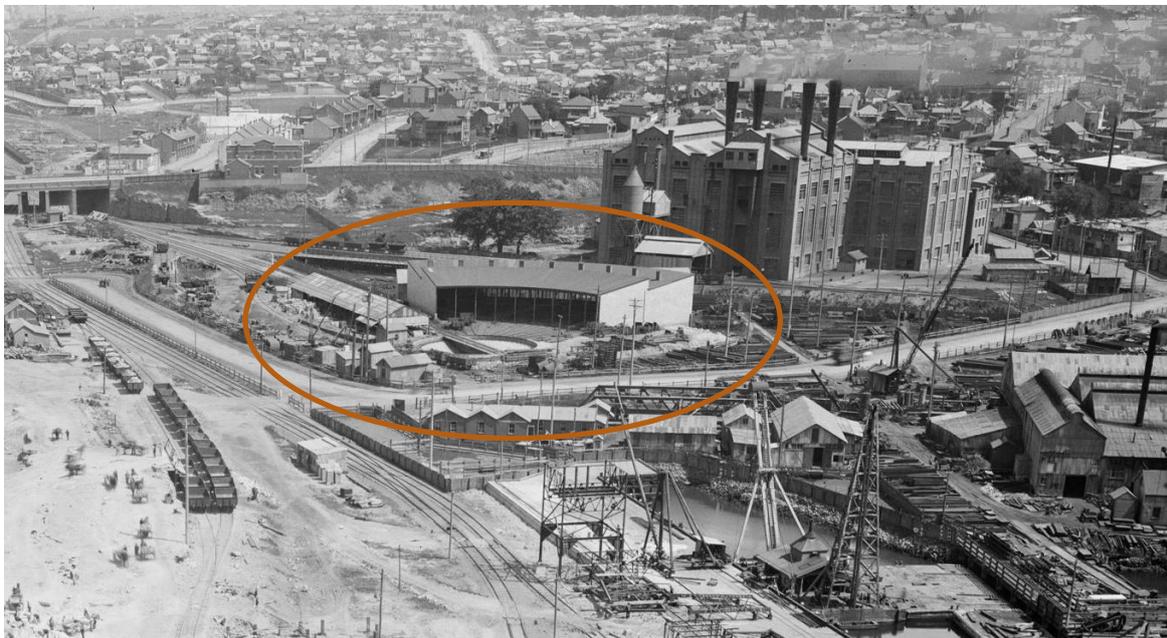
The White Bay Power House site, 28 September 1920, with the area of the turntable circled. The roundhouse appears completed and the Concrete Works have been added to its south (left). Note the newly formed Swan Street deviation on the left, involving demolition of some earlier sheds near the Swan Street crossing. Source: SLNSW, FL 412658²²⁴
